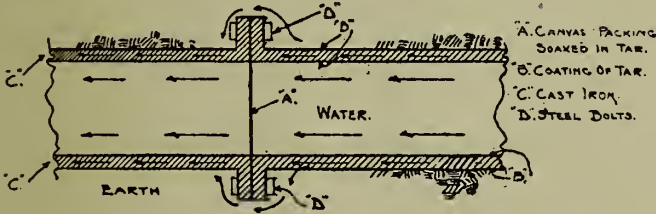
FIG. H. SECTION OF FLANGE CAST IRON PIPE.
